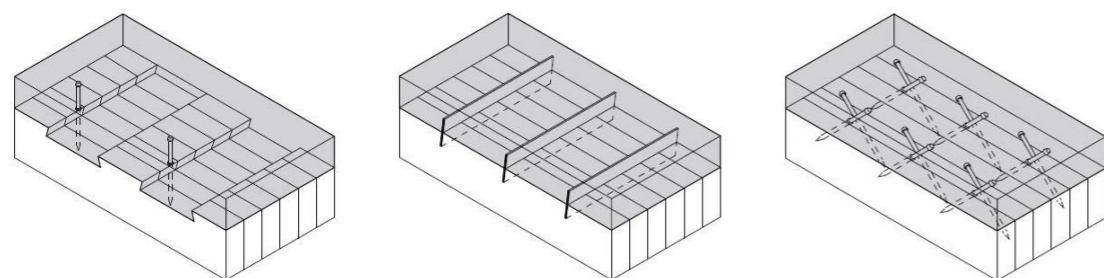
Kaufman, Krötsch & Winter (2018) Mechanically connected concrete timber floors
